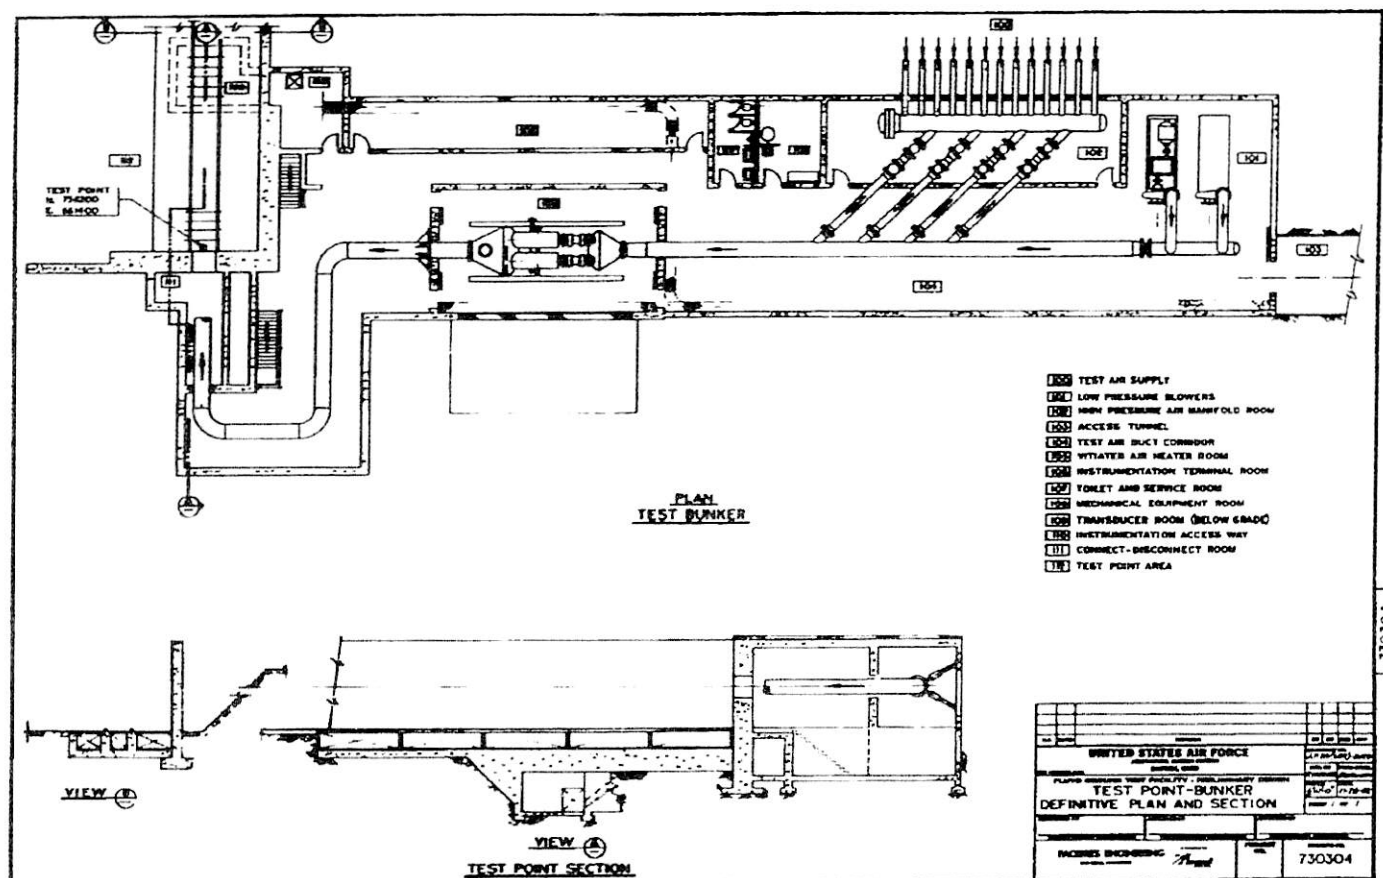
Test Point--Bunker--Definitive Plan and Section
